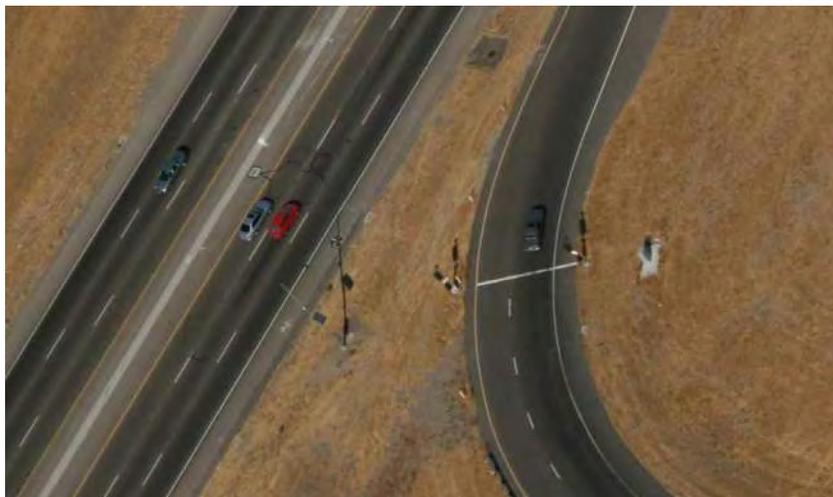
New EB Ramp Meter at Mountain House Parkway
